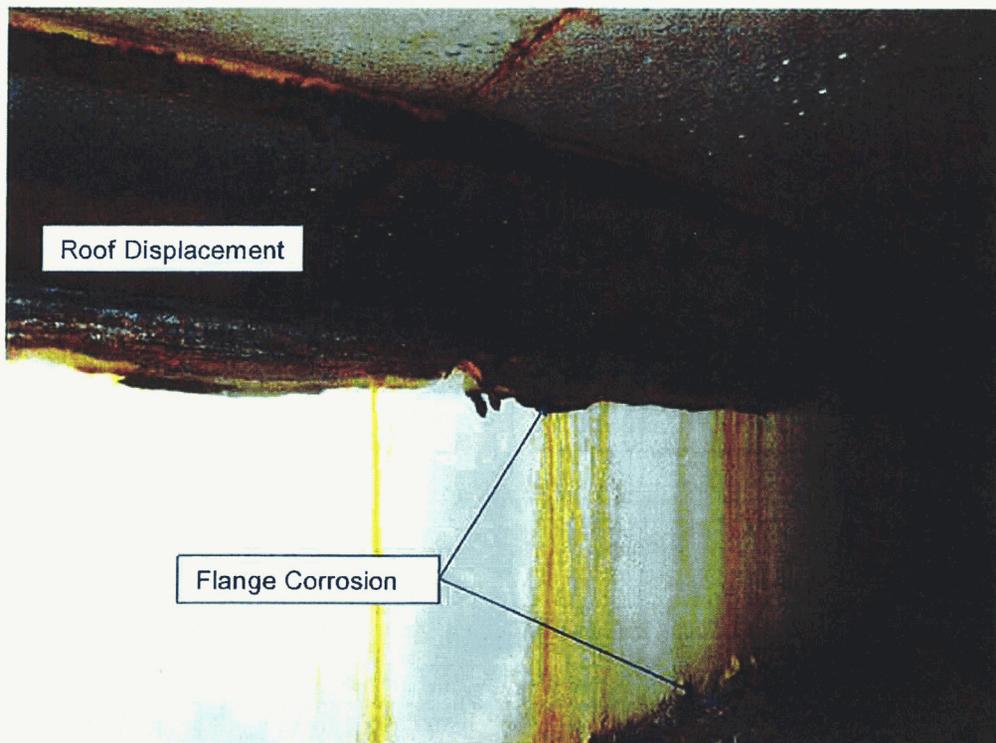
Flange Corrosion & Roof Distortion
